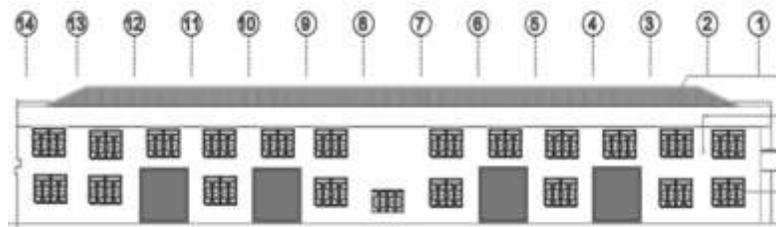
Rear elevation of the Engineering Building 2 showing the location of shear walls.
